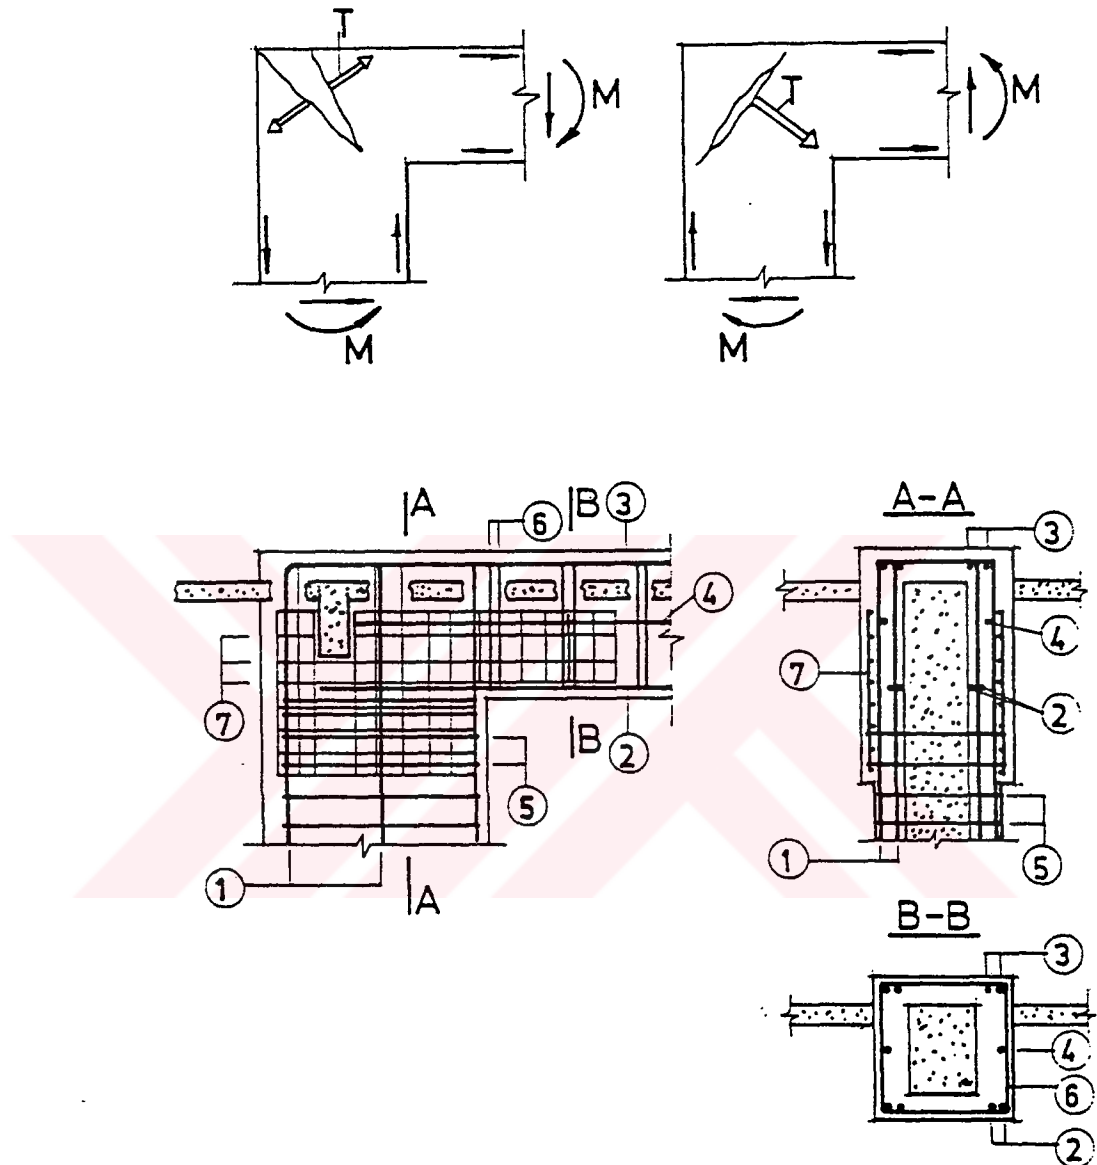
Technique for strengthening column-beam joint by concrete jacket with additional reinforcement
